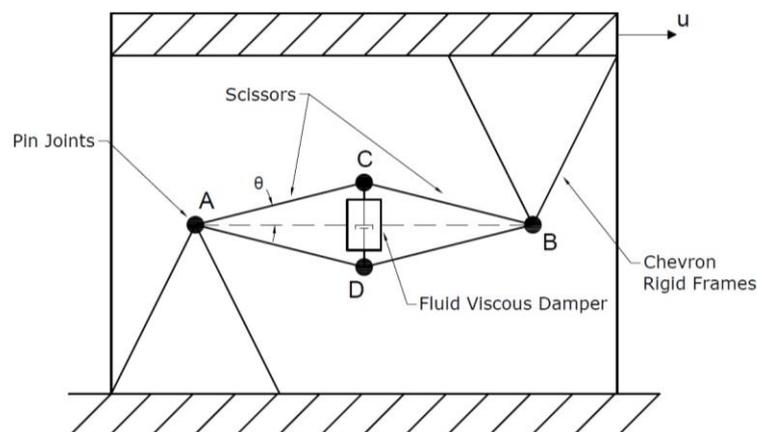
Horizontal-Scissor-Jack brace-damper system.
